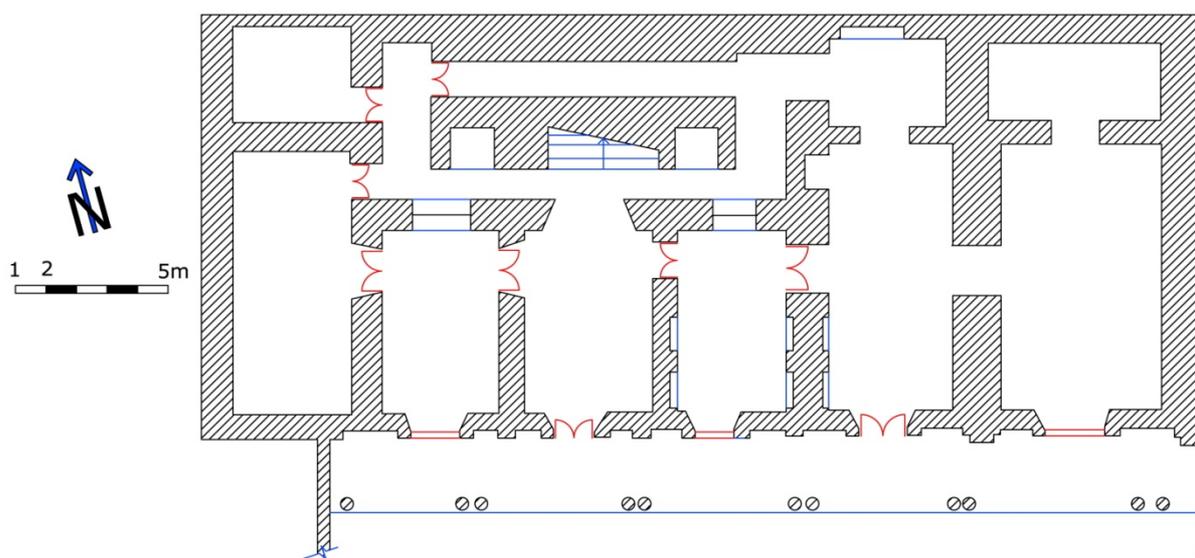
Ground floor plan, Source: Kasmaei 2005, p.81 (my drawings)
